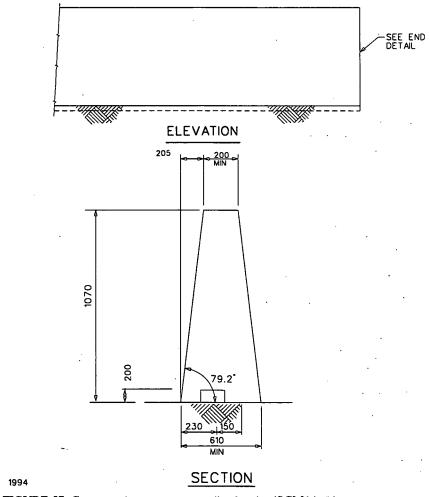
Constant slope concrete median barrier (SGM14a-b).
